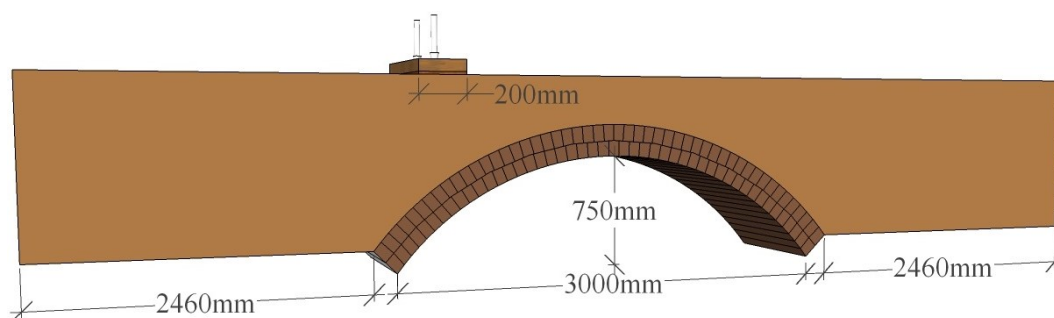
Geometric characteristics and loading arrangement for *Bridge 3-3
